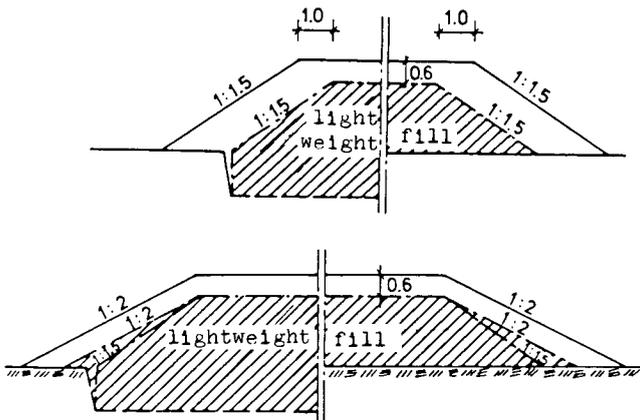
Cross sections of road embankments built of light-weight expanded clay (41). Dimensions in metres.
